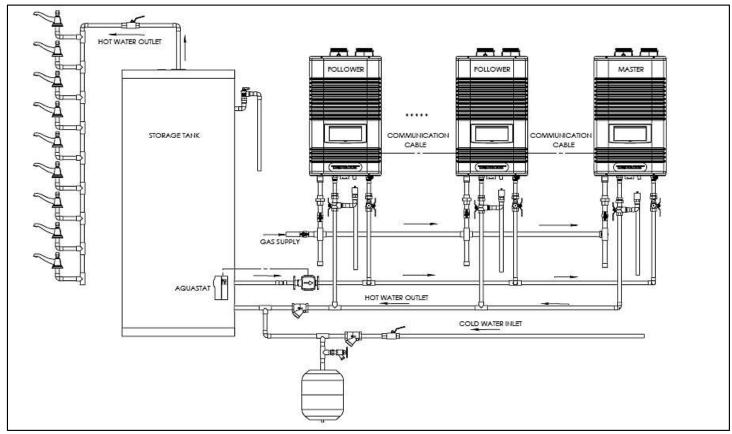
Multiple Water Heater Piping – Cascaded System with Storage Tank
